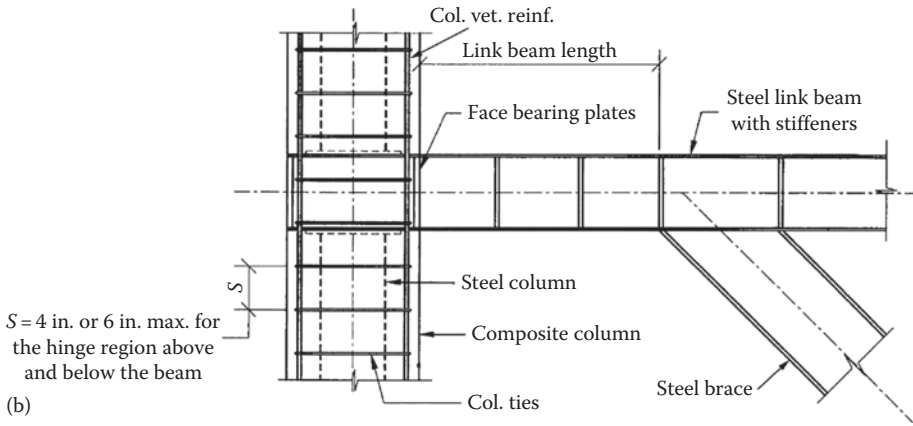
(Continued) Schematic details of link beam: (b) link adjacent to column.
